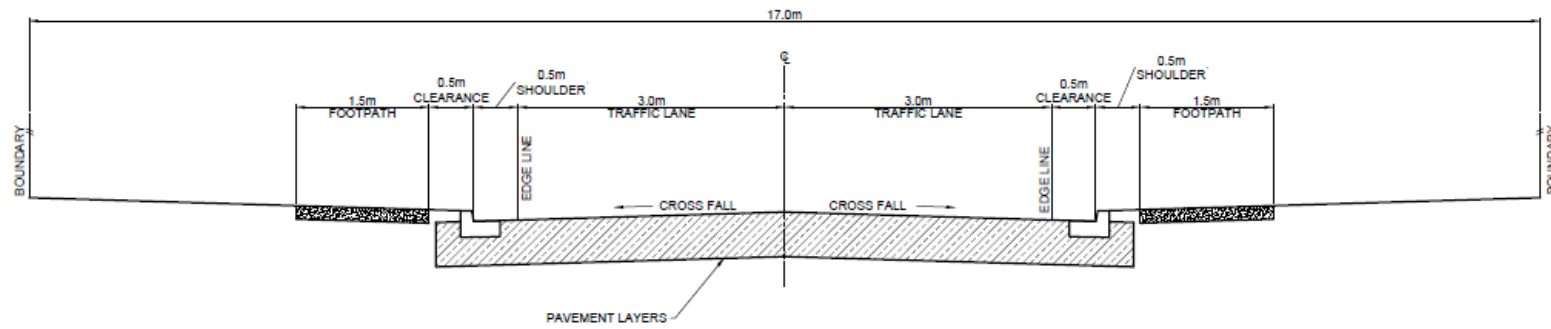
Tamahere RLZ – Rural lifestyle zone – road cross sections
